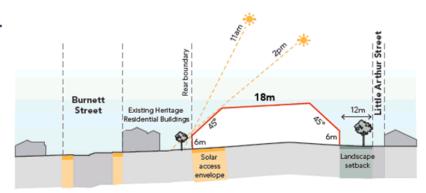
Landscaped front setback between Condell Place car park and Little Arthur Street
